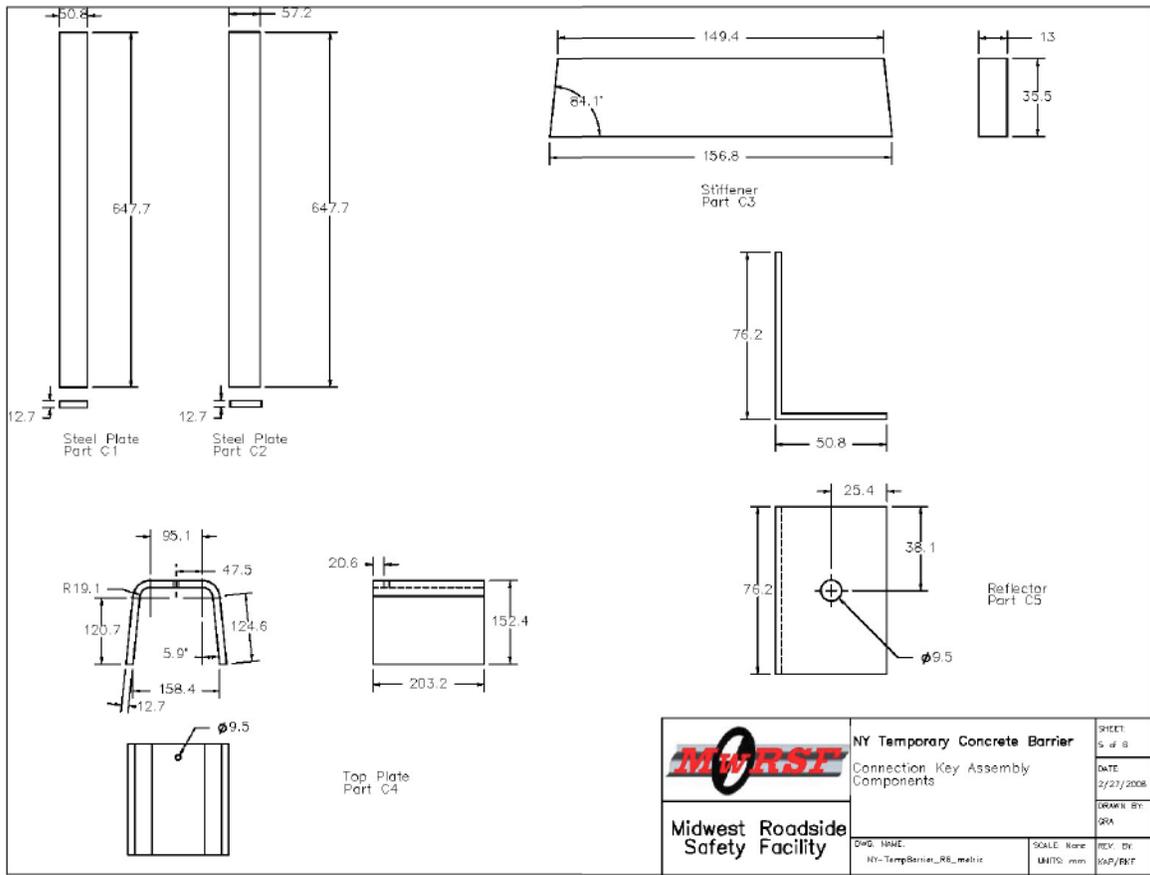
Connection Key Assembly Details, Test NYTCB-2
